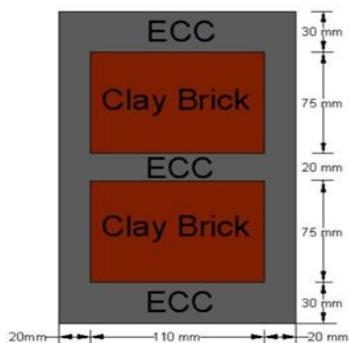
Cross-section of masonry beam with ECC as bed joint
